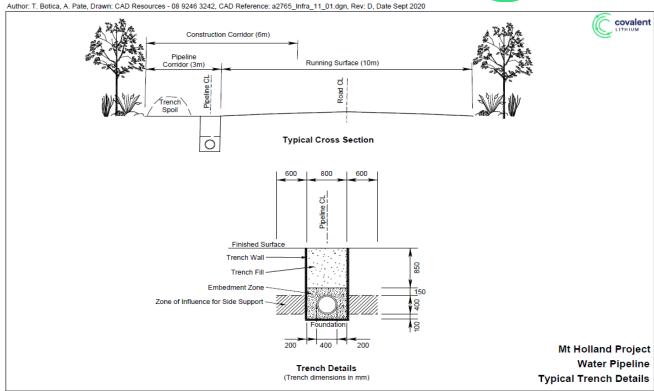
Typical trench details (NEEDS TO BE UPDATED)
